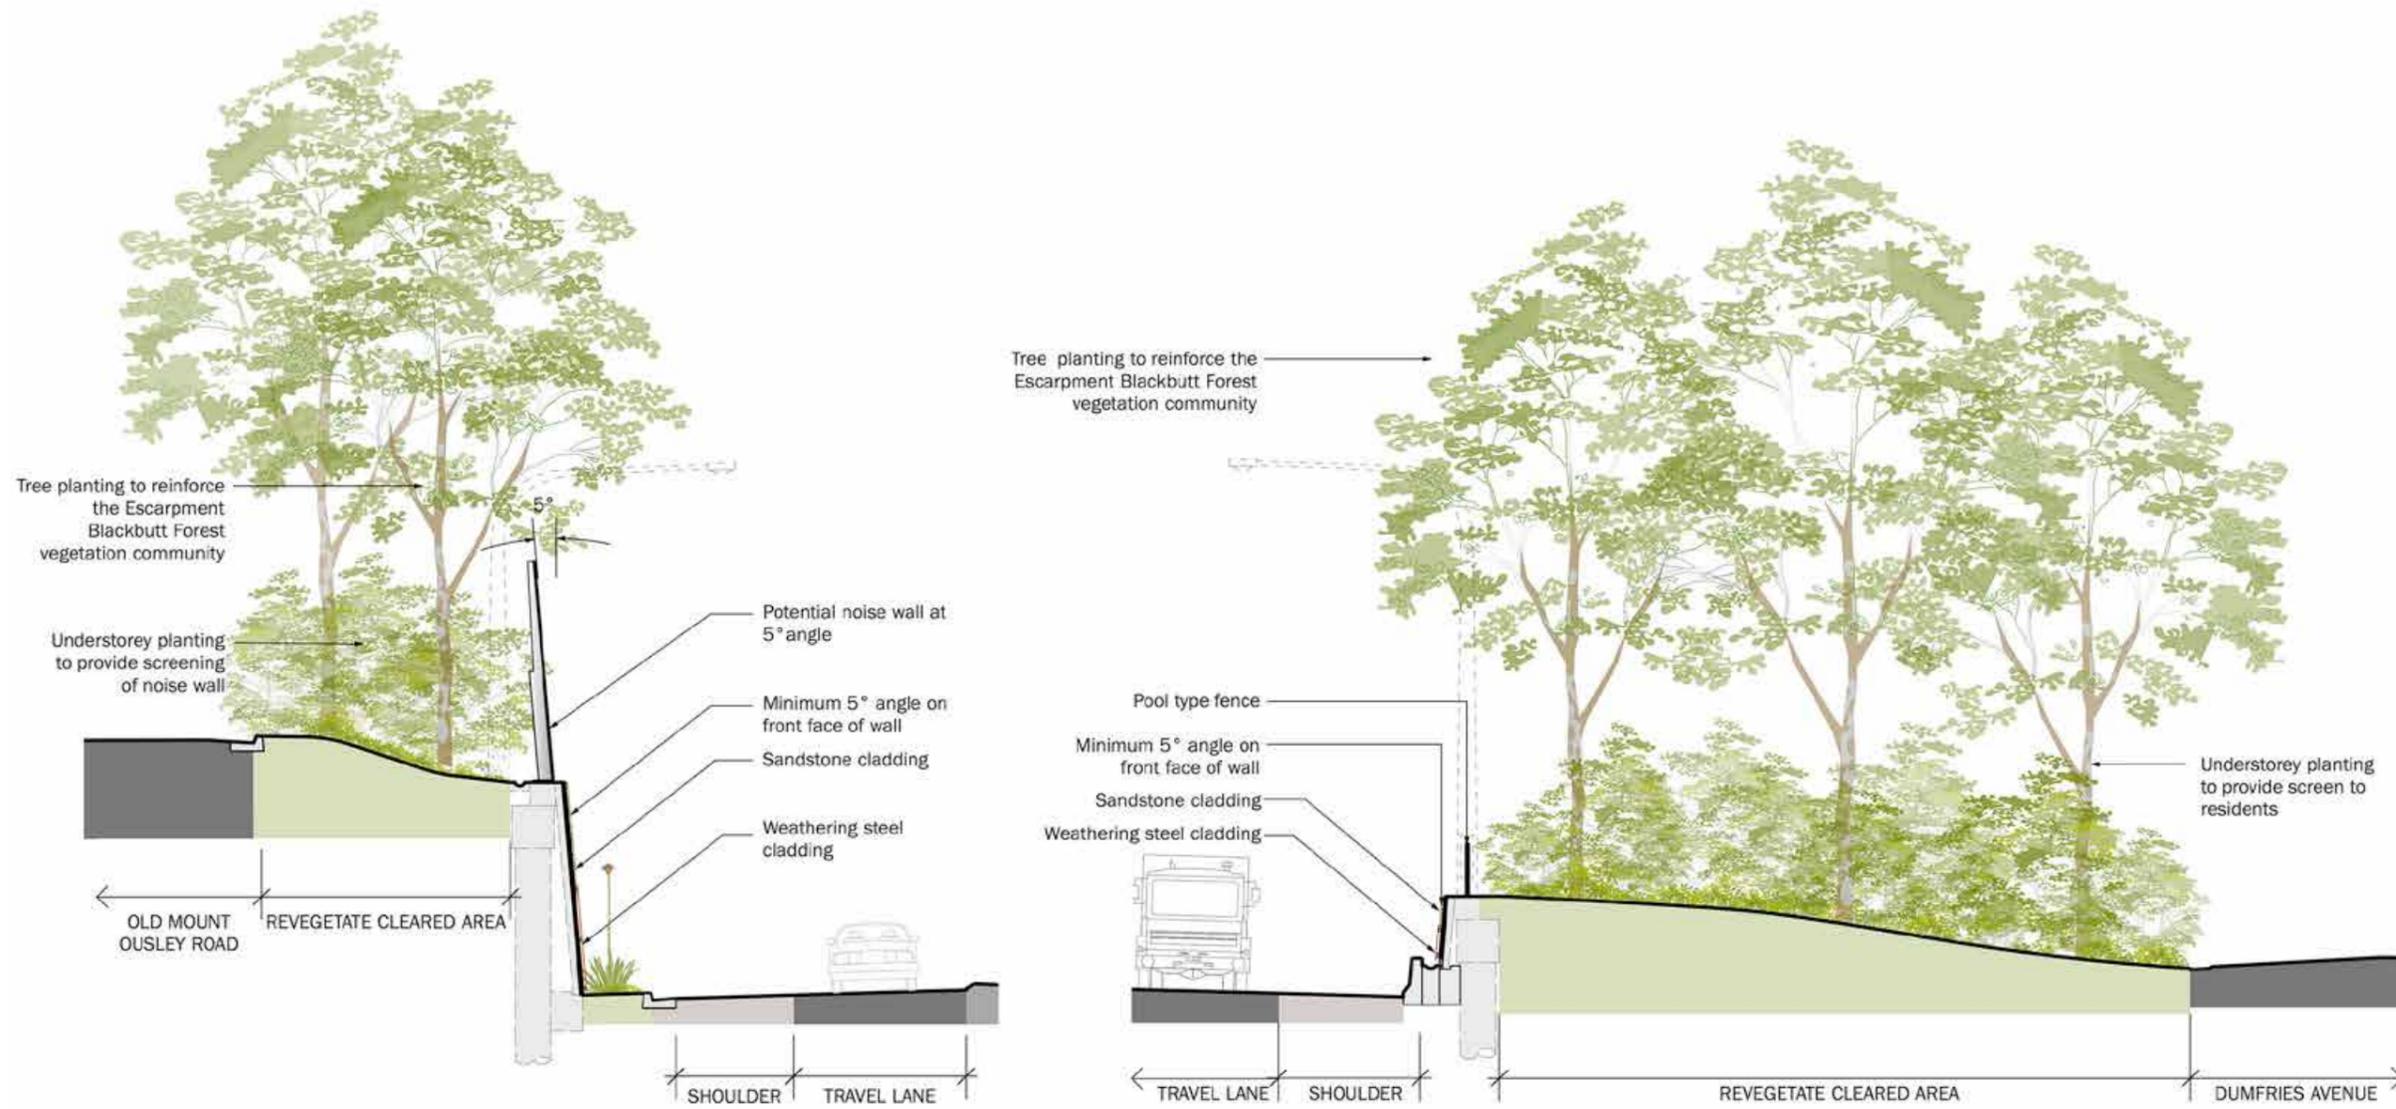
Section of retaining walls facing Mount Ousley Road - Finish type RW-F2a (Scale 1:150)
